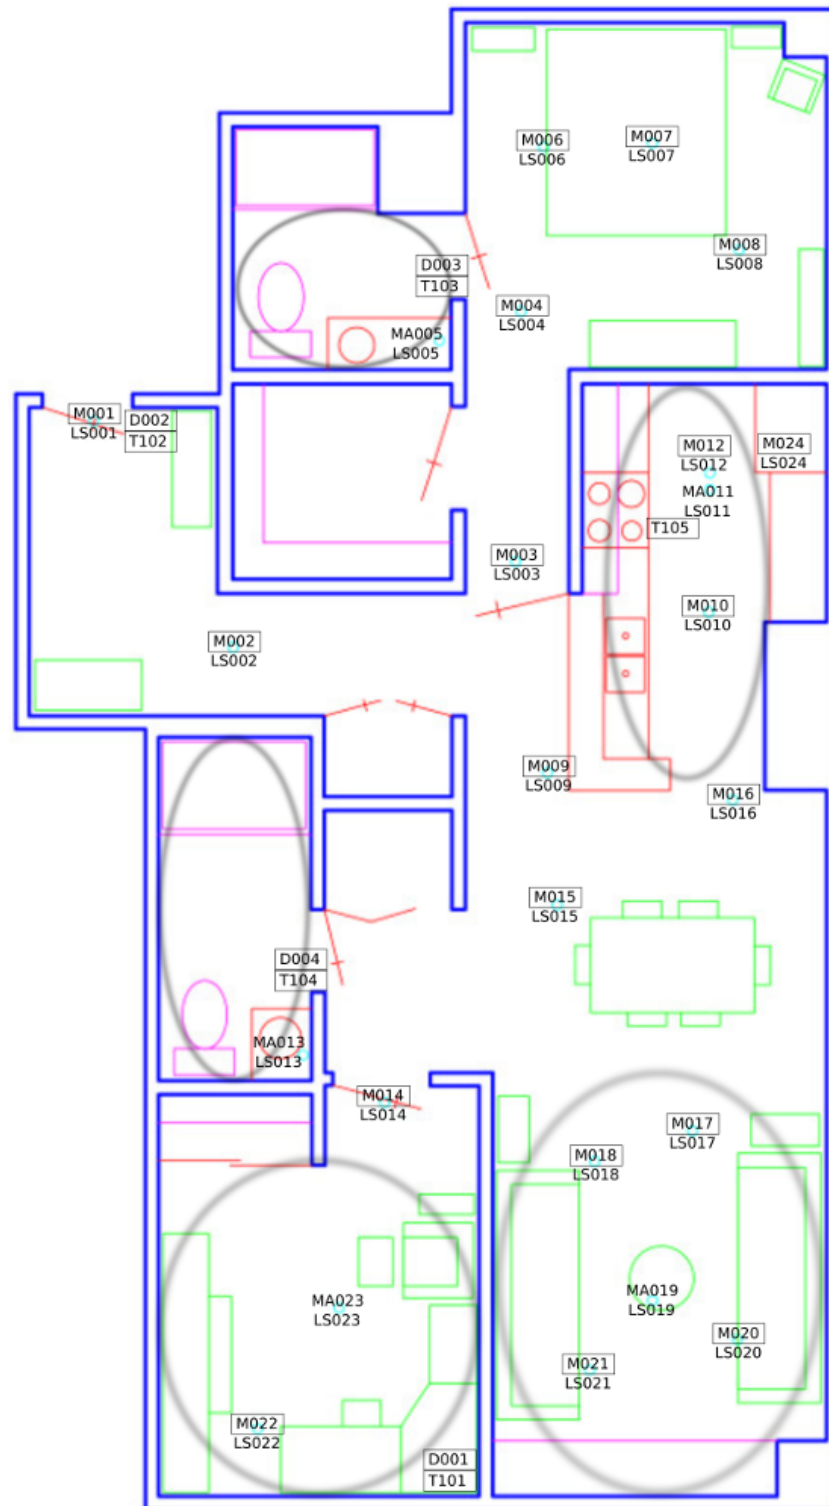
Floor plan and sensor placement for the testbed hh122.
